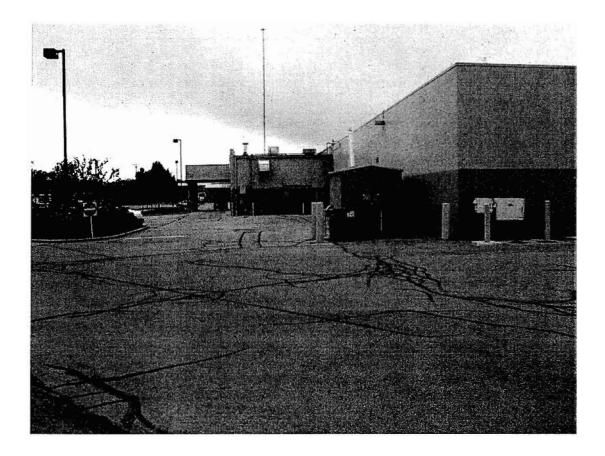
View (to west) of site area subject to cap maintenance plan. Residual soil impacts located beneath building extension (in center), southern portion of main building (right) and and paved area in right center of picture. Impacted groundwater below paved areas in foreground and background.
